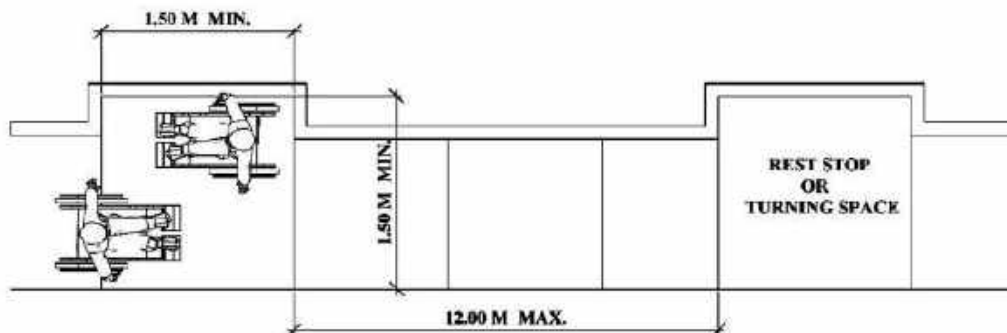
Rest Stops or Turning spaces on Sidewalks and Walkways
